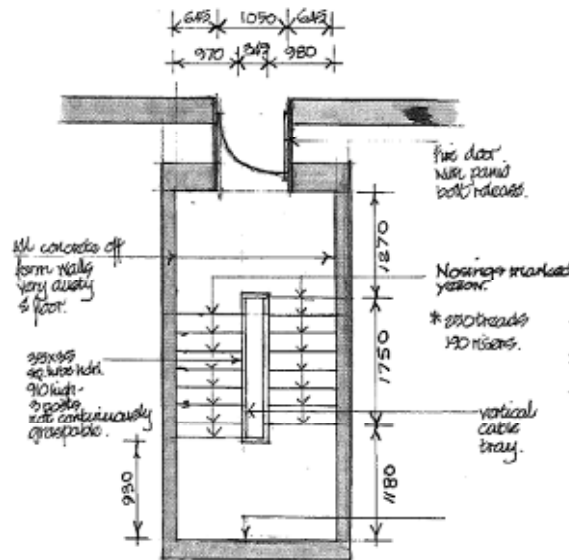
Manchester "Dirty" Stair Plan – Diagram not to Scale
